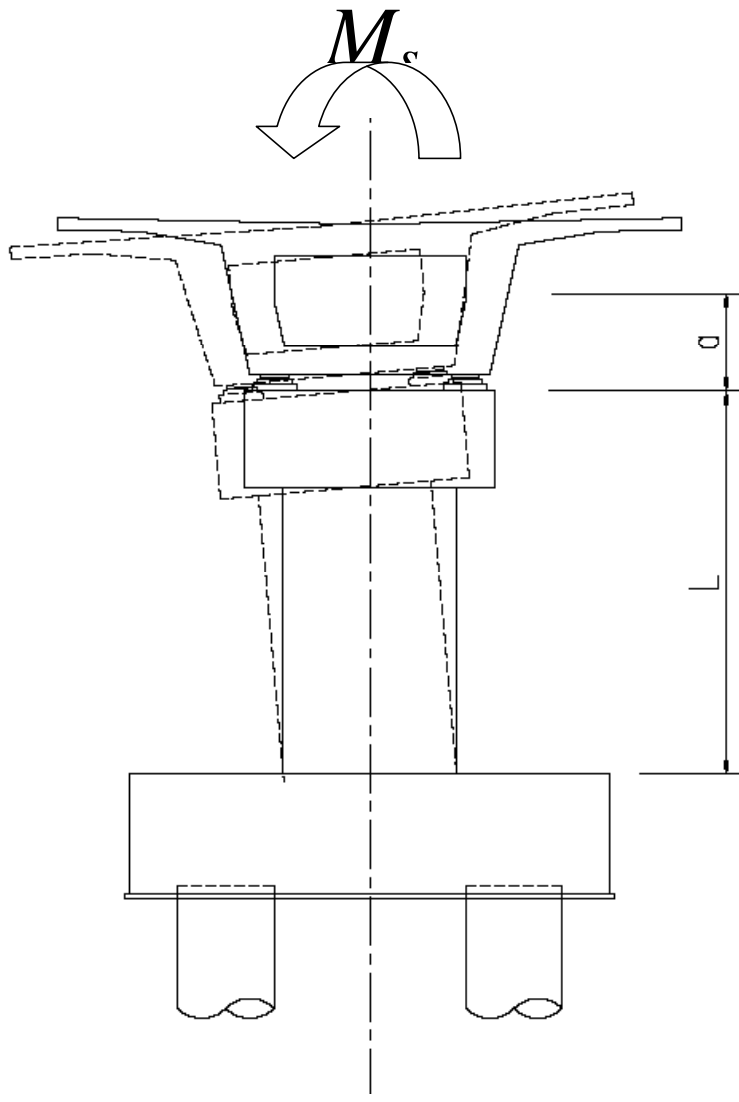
Elevation of Bridge in the Transverse Direction
